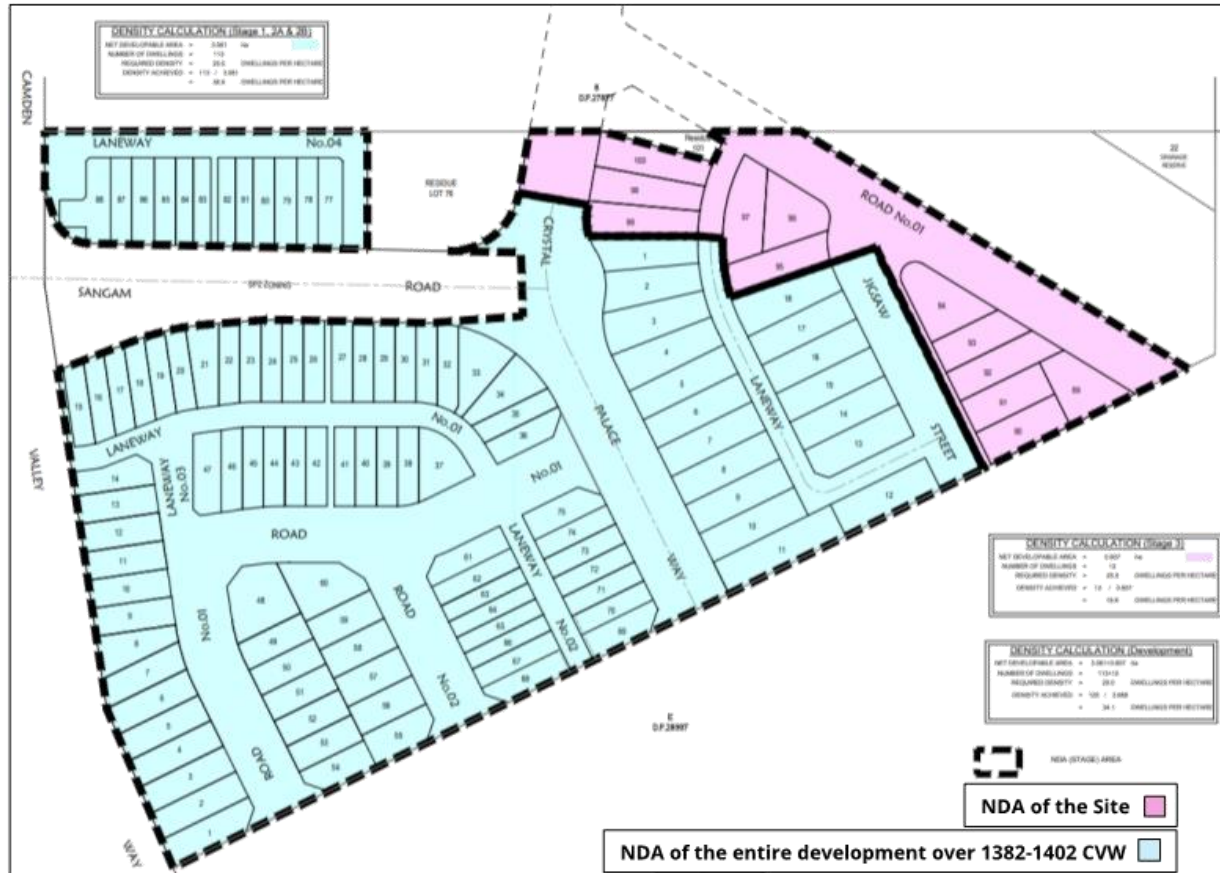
Proposed Subdivision and NDA Plan for the Site (CED NSW 2025f)
